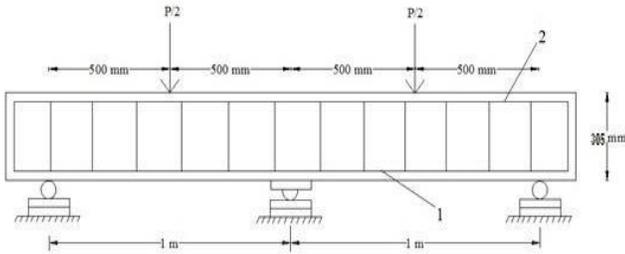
Detailing of reinforcement1, 2 – top and bottom steel reinforcement
